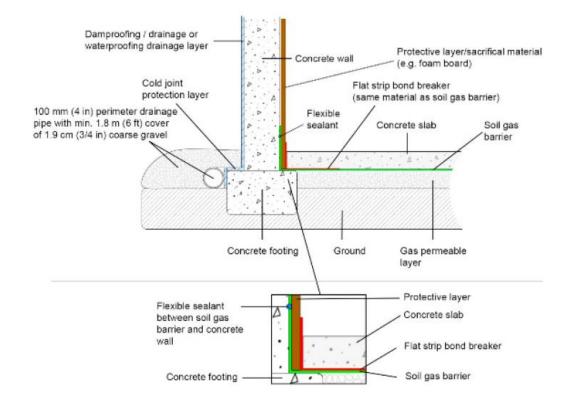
Installation of soil gas barrier on concrete foundation (without insulation - alternative)
